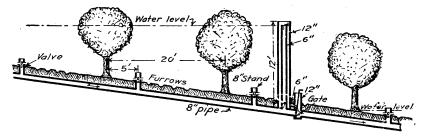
The use of underground pipe in furrow irrigation, showing risers and stand.
